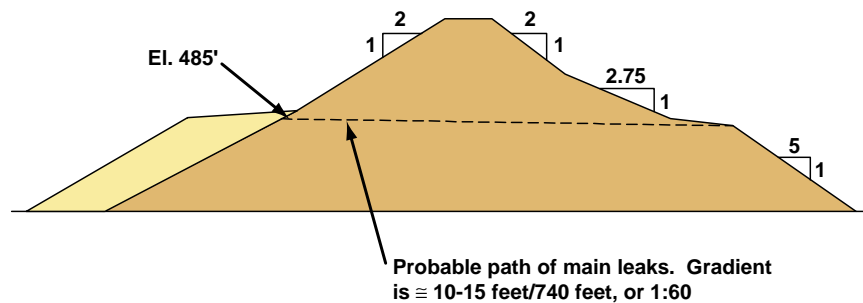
Cross section of Wister Dam showing probable path for internal erosion through embankment. The length of the flow path was about 740 feet, and the head on the entrance tunnels was less than 15 feet.
